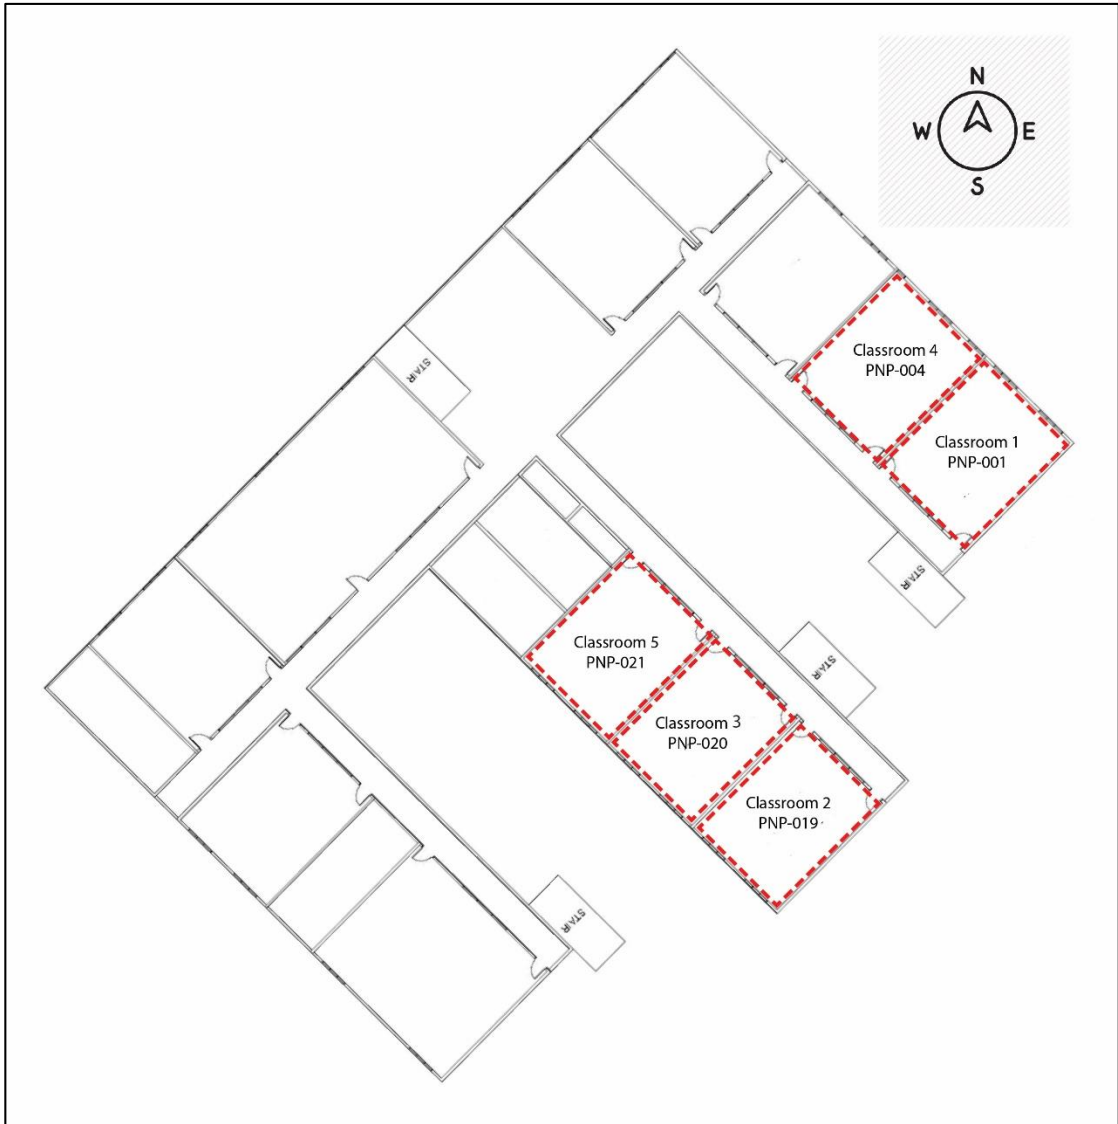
Kolej Genius Insan Second Level Floor Plan and Selected Classrooms
